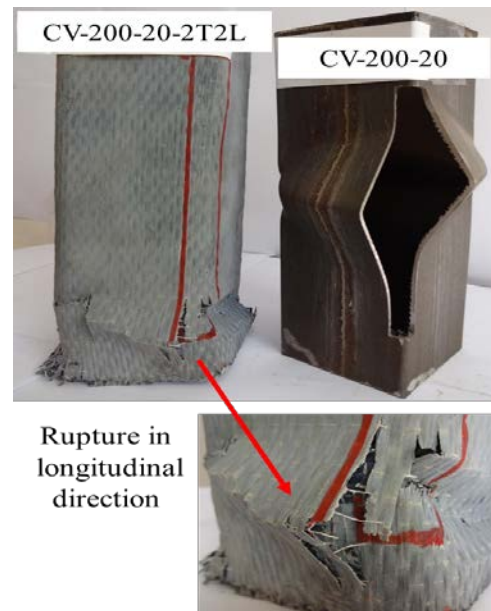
Strengthened columns with vertical damage (200×20 mm²) at the corner
